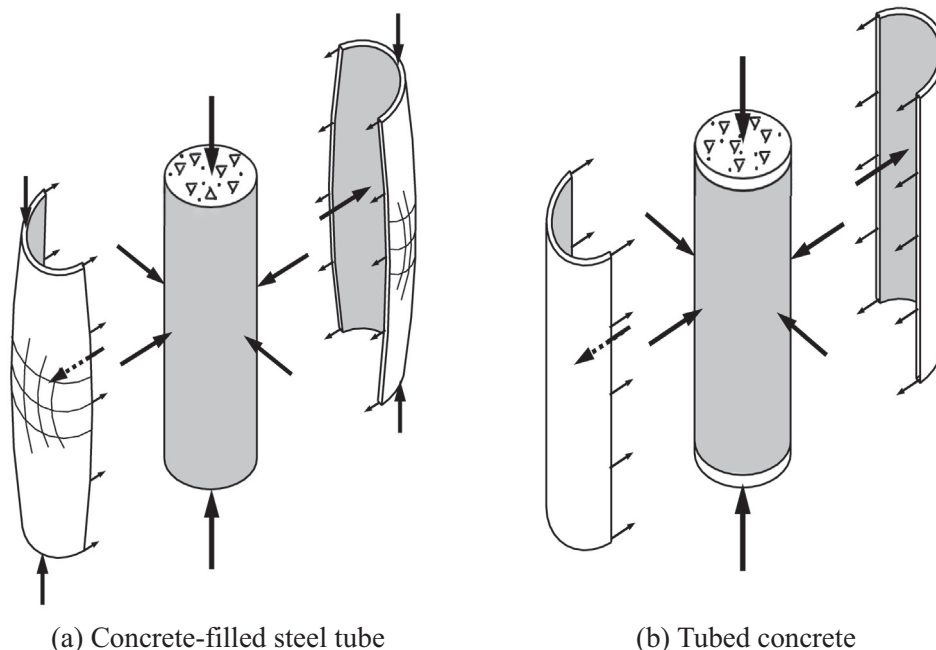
Comparison between concrete-filled steel tube and tubed concrete members.
